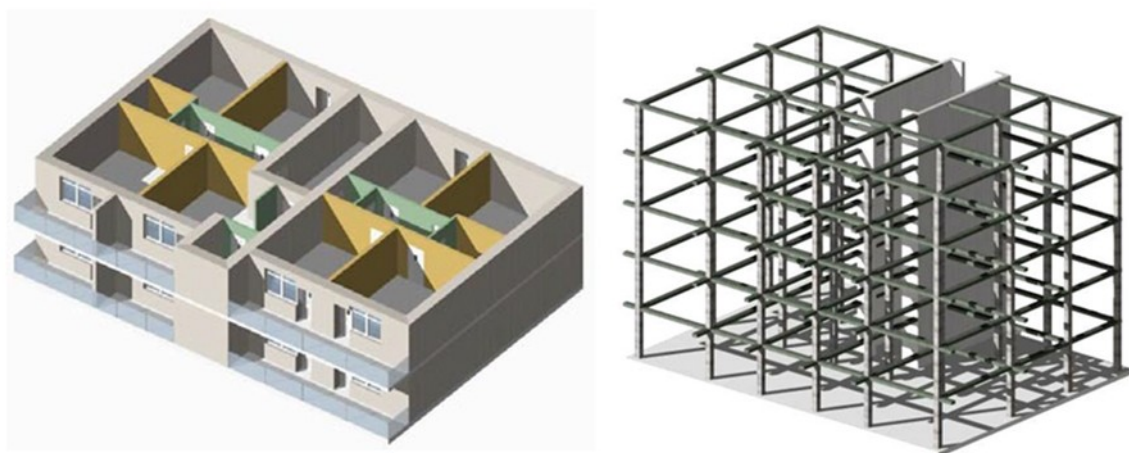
Load bearing masonry structure (left); reinforced concrete frame structure (right)
